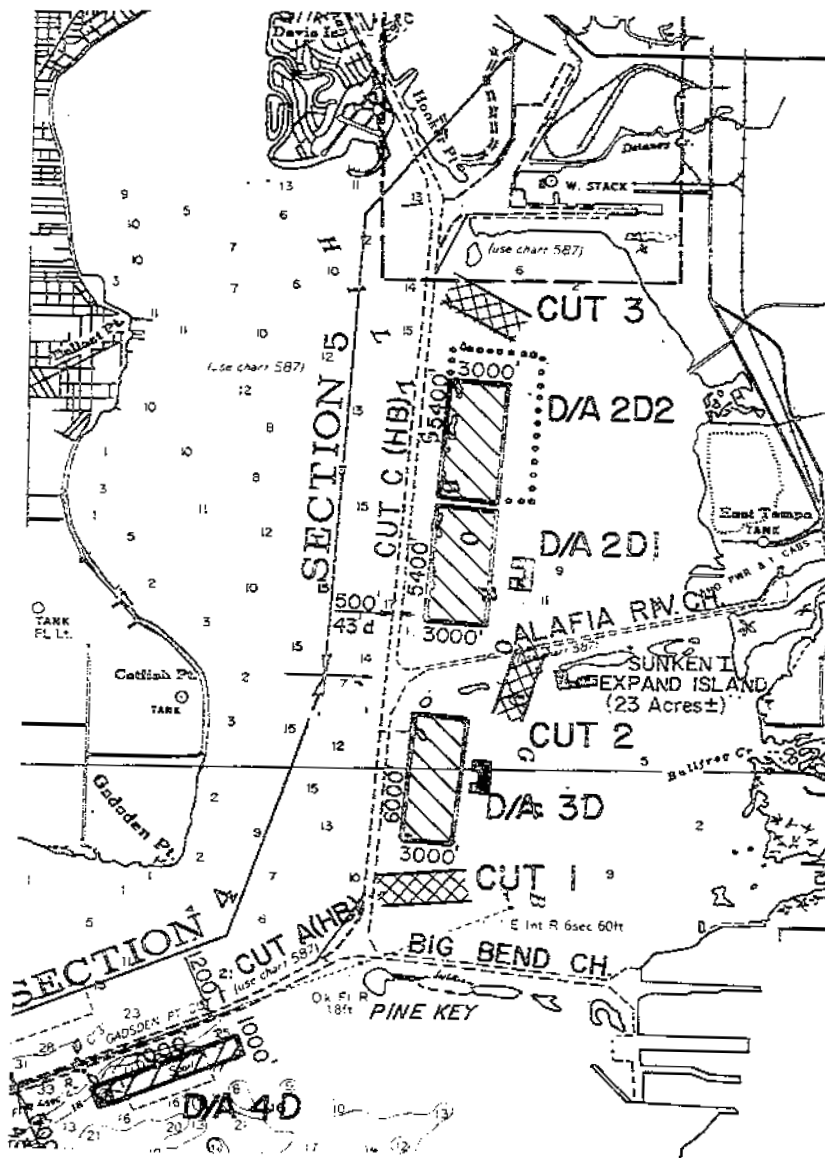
Proposed spoil disposal plan, Hillsborough Bay.
